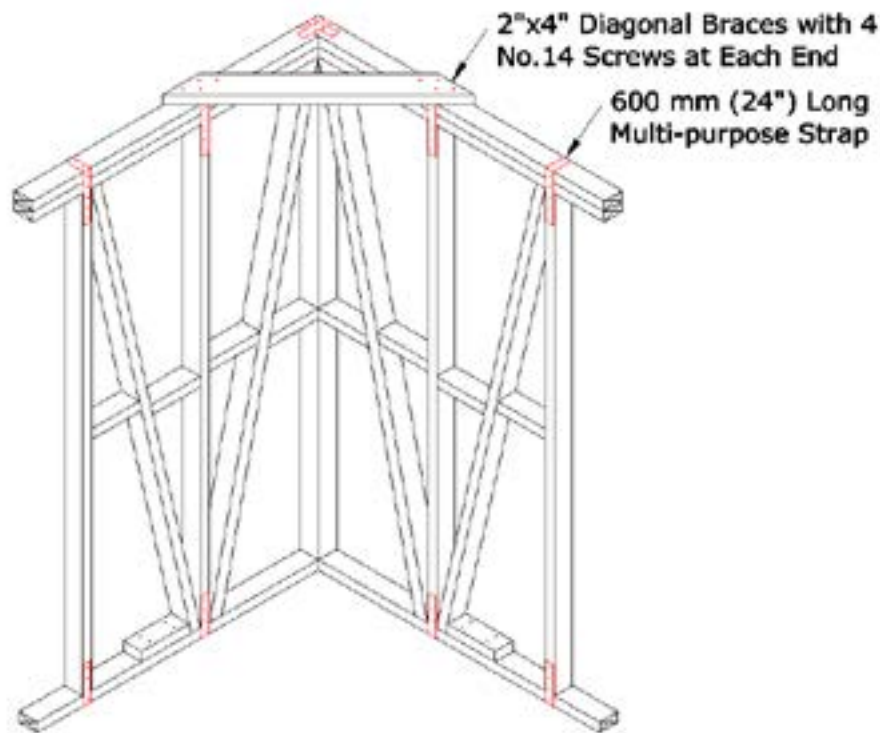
TIMBER FRAME BRACING AT WALL JUNCTIONS
